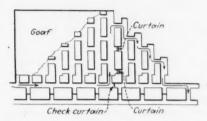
Check curtain has been advanced to beyond eighth room to ventilate advancing rooms.
